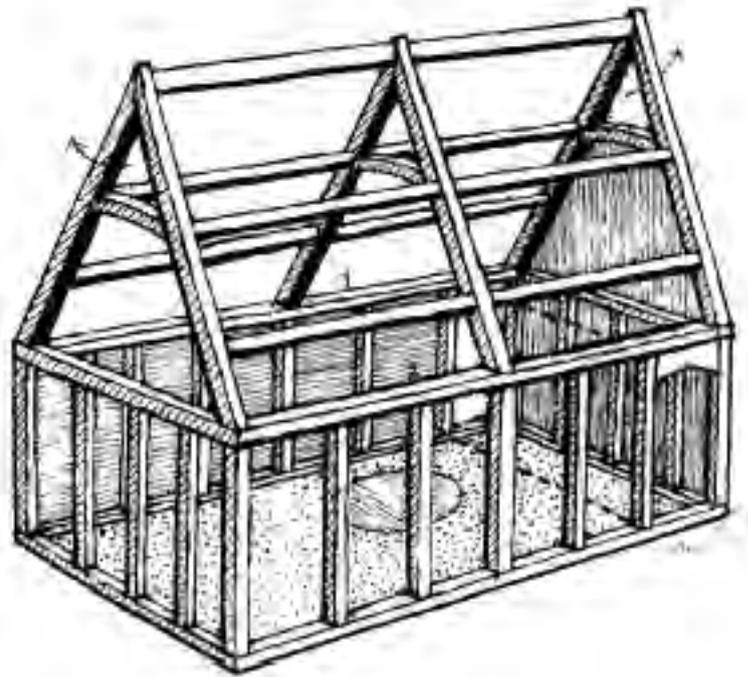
Simple single-storey two-bay timber-framed hall house with cross passage and central hearth. The arch-braced roof with principal rafters, purlins and ridge pole is identical with that in the existing house, with roof plates (1 and 2) still in position.
